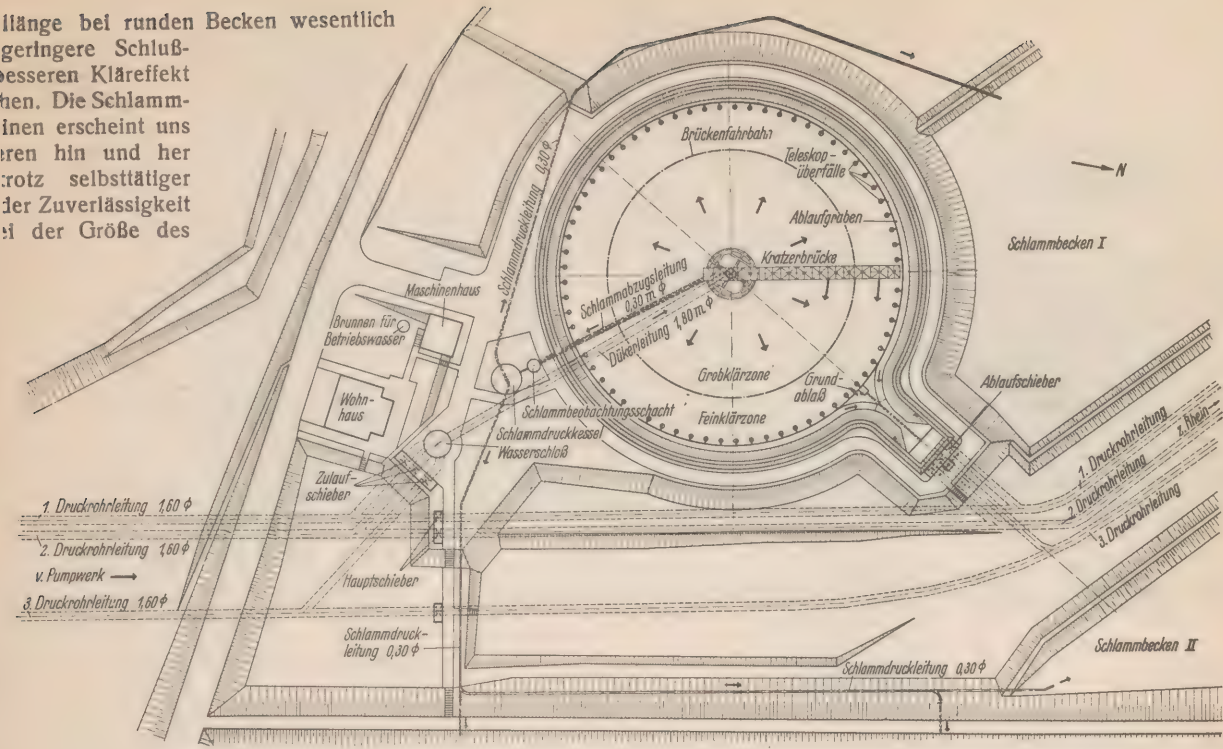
a, Alte-Emscher Sewage Plant. General Plan
